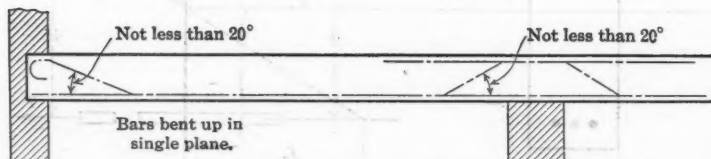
TYPICAL REINFORCED CONCRETE BEAM; PRINCIPAL LONGITUDINAL BARS BENT UP IN SINGLE PLANE.
